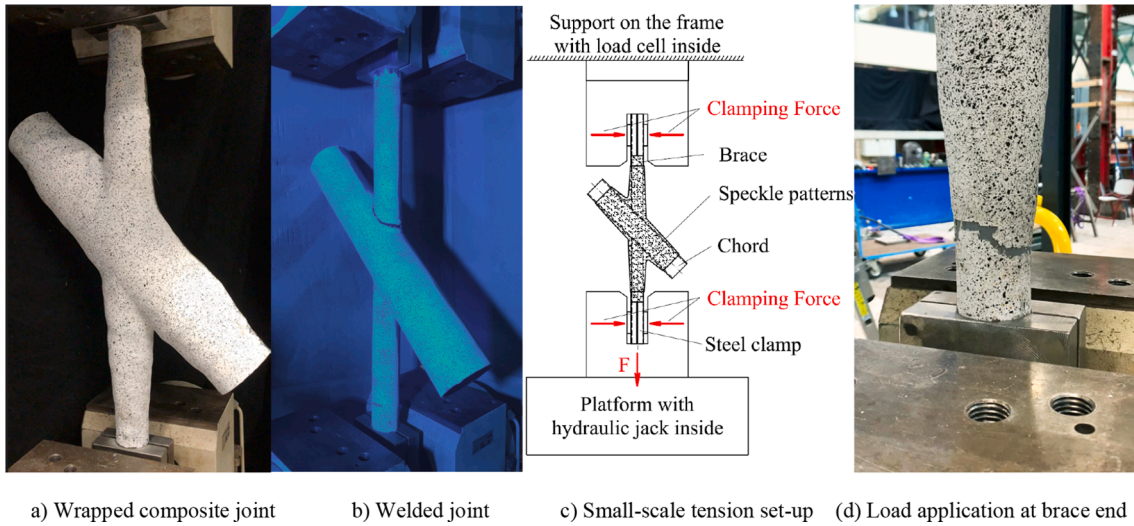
Test set-up of small-scale 45° X joints under tensile/compressive axial load.
